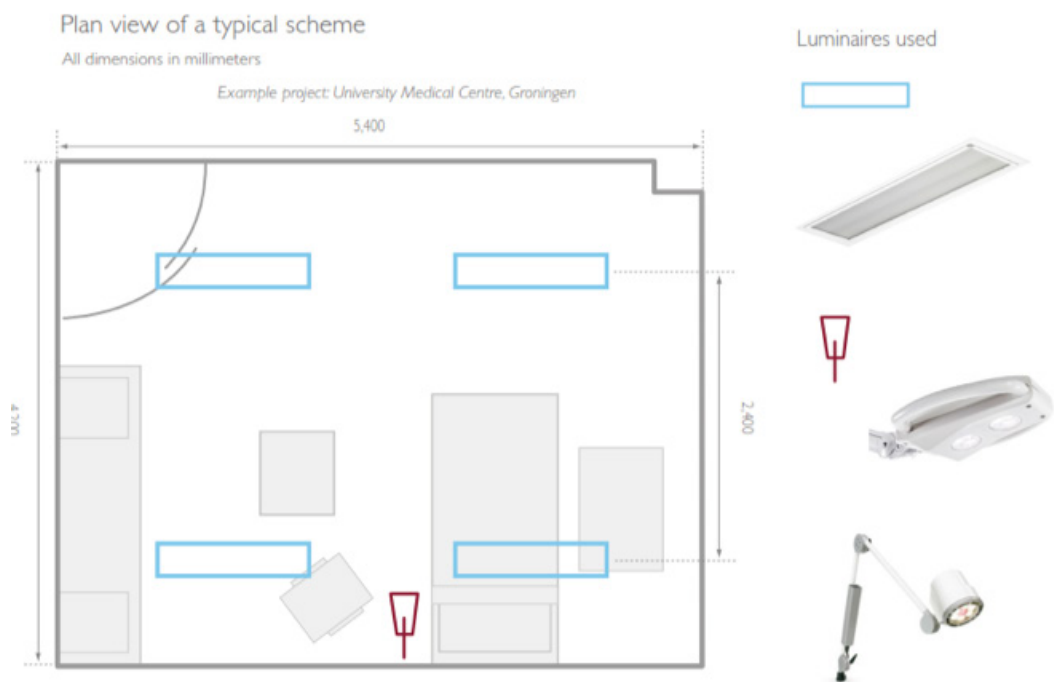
Typical Examination Room Lighting Design (Source: Philips)
